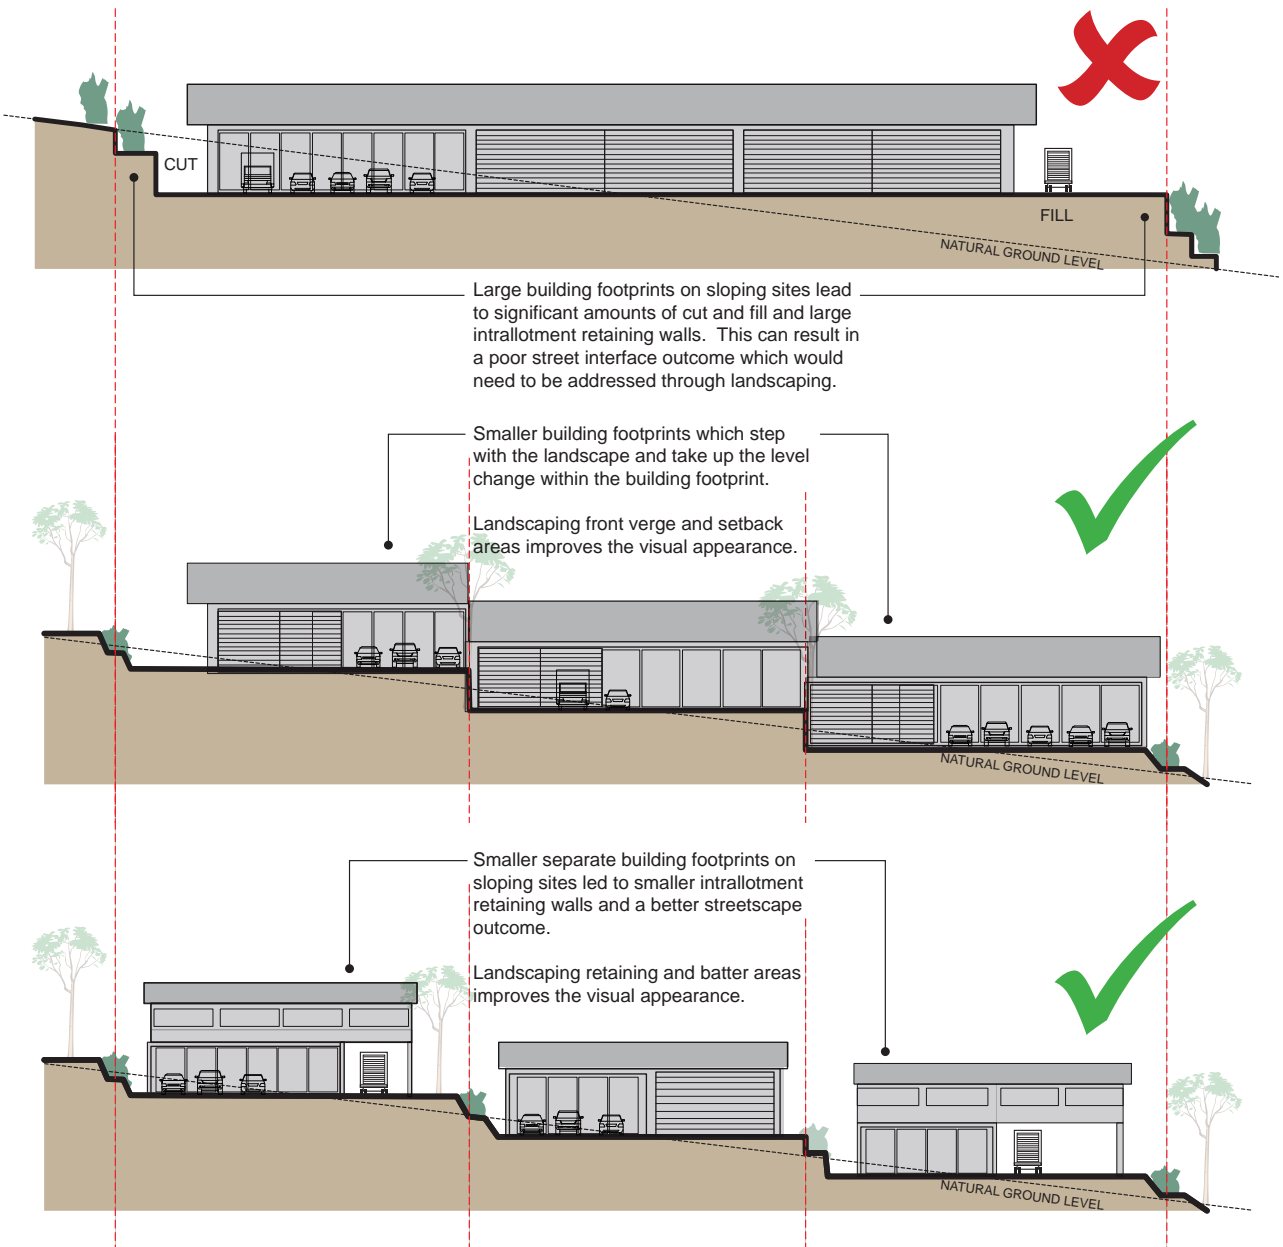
Cut and Fill - On sloping sites, building type and use needs to be appropriately suited to the site conditions. Large floorplate development on sloping sites leads to large amounts of earthworks and retaining walls. A series of smaller building footprints will assist in reducing interface retaining wall heights by stepping with the land form.
